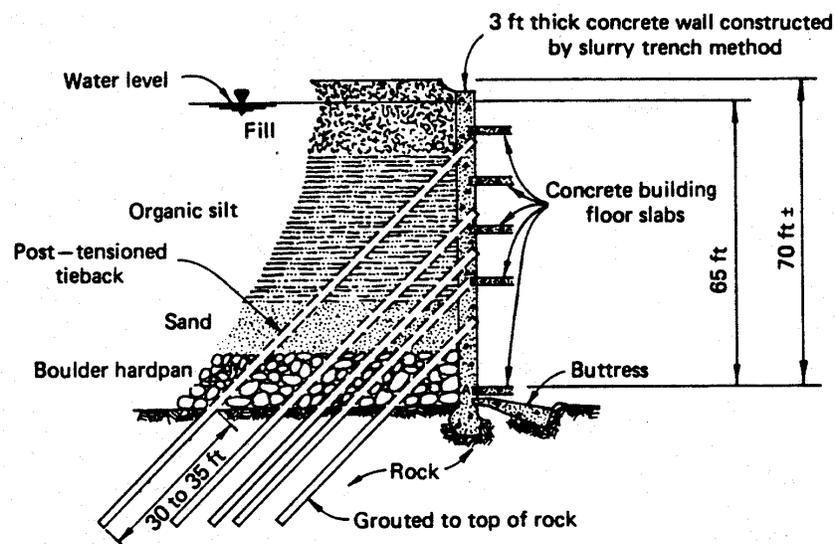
Tied-back concrete wall constructed underground for excavation support
